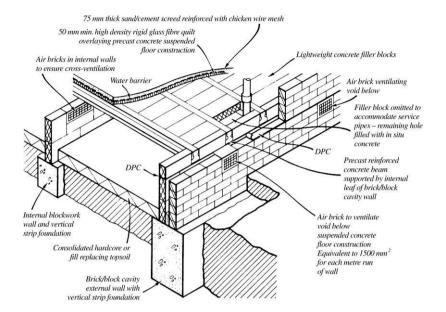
Suspended ground floor construction using precast concrete flooring units.
